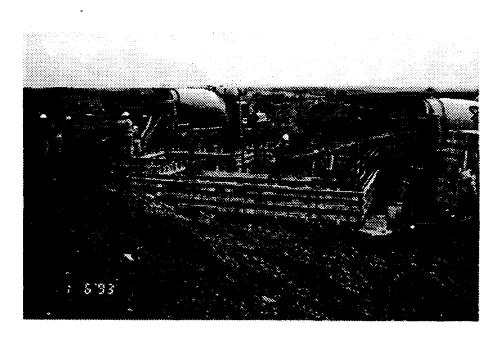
Foundation Walls Being Cast at the Eldersberg Site.
